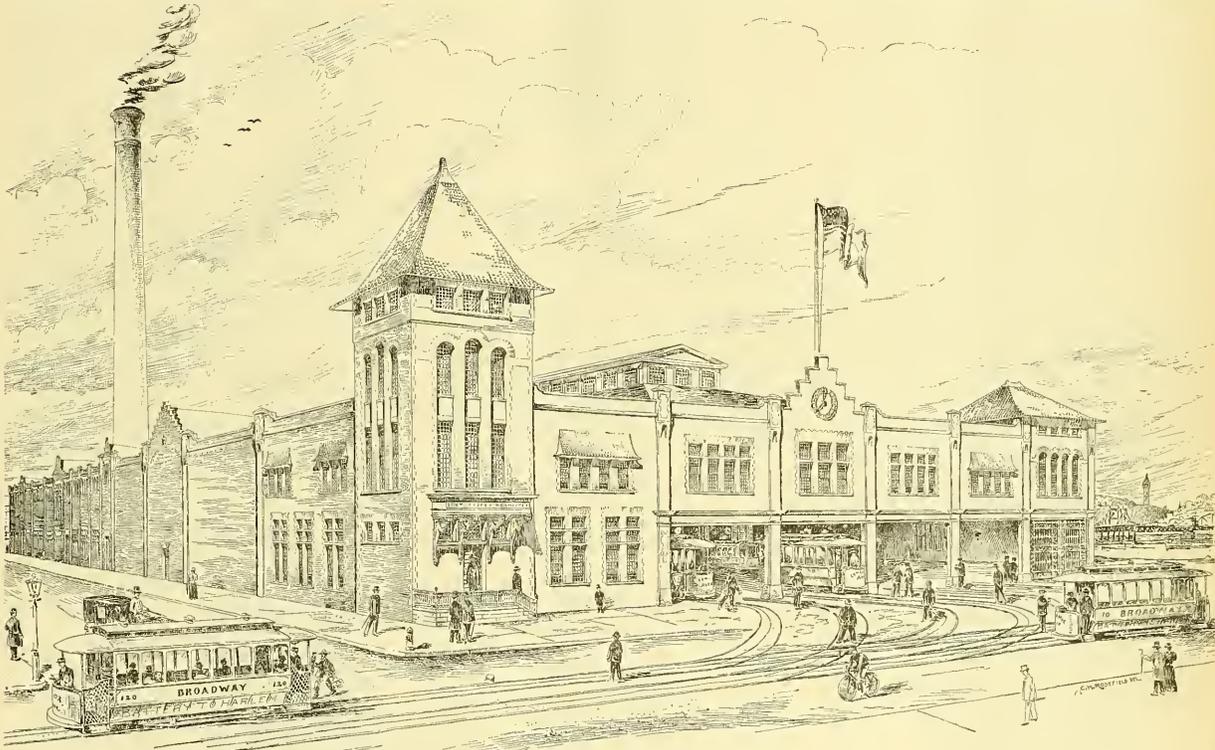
PROPOSED POWER STATION AND CAR HOUSE OF THE LENOX AVENUE CONDUIT RAILWAY.
